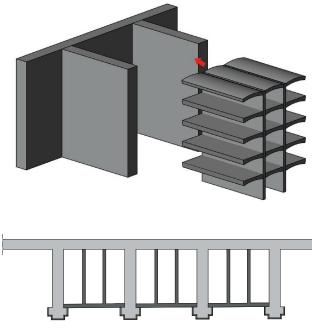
Structural scheme of historical cemeteries built entirely in masonry.
